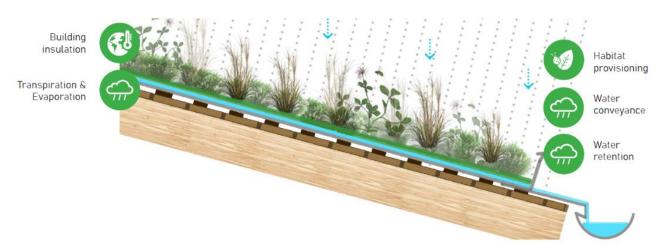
Typical layers of a constructed wet roof, ©UNaLab41
